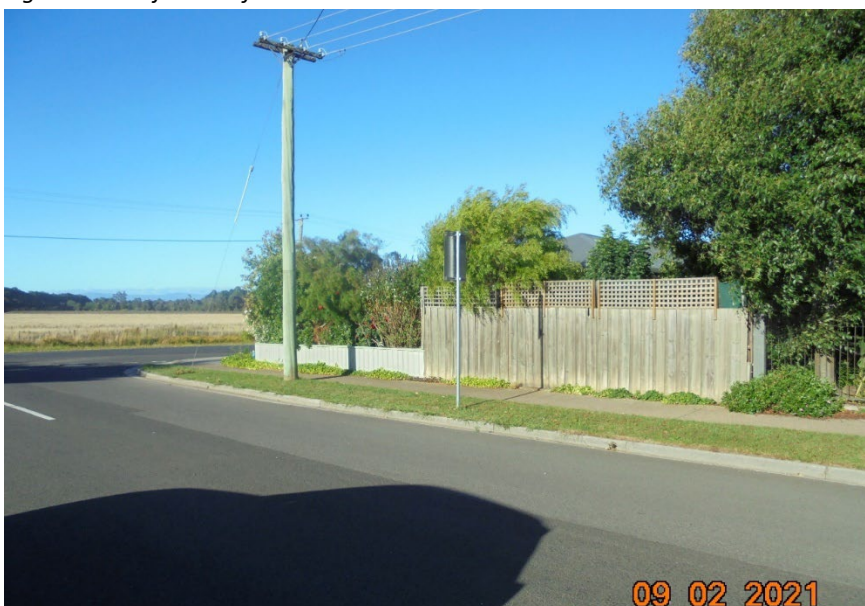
exposed concrete aggregate footpath in Scone Street and adjacent crossover
